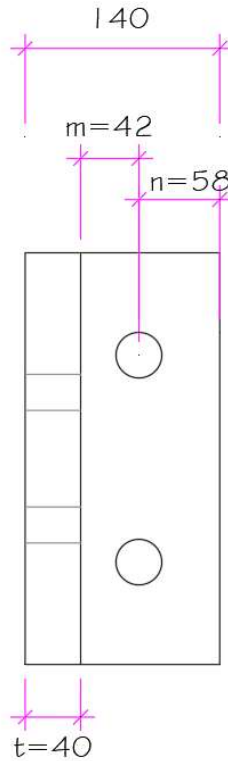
Dimensions of the clamping angle base plate in yieldline theory
